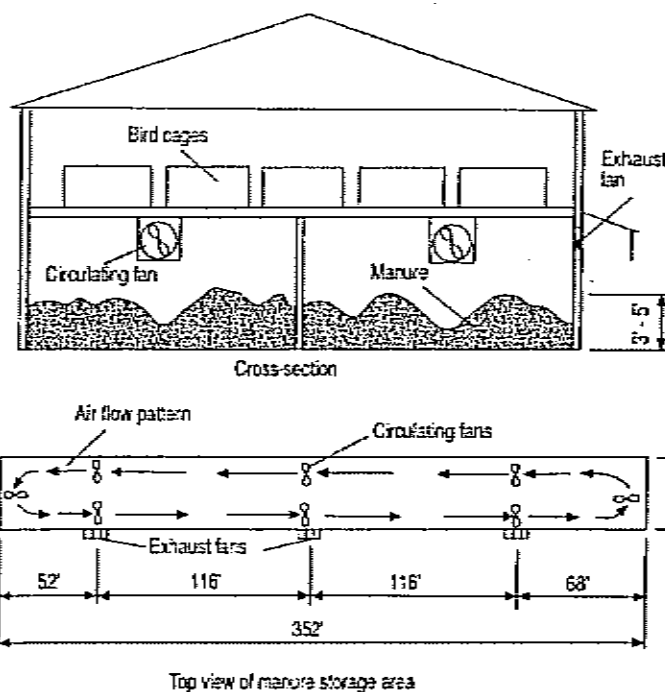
Ventilating the manure pit in a typical high-rise poultry building
